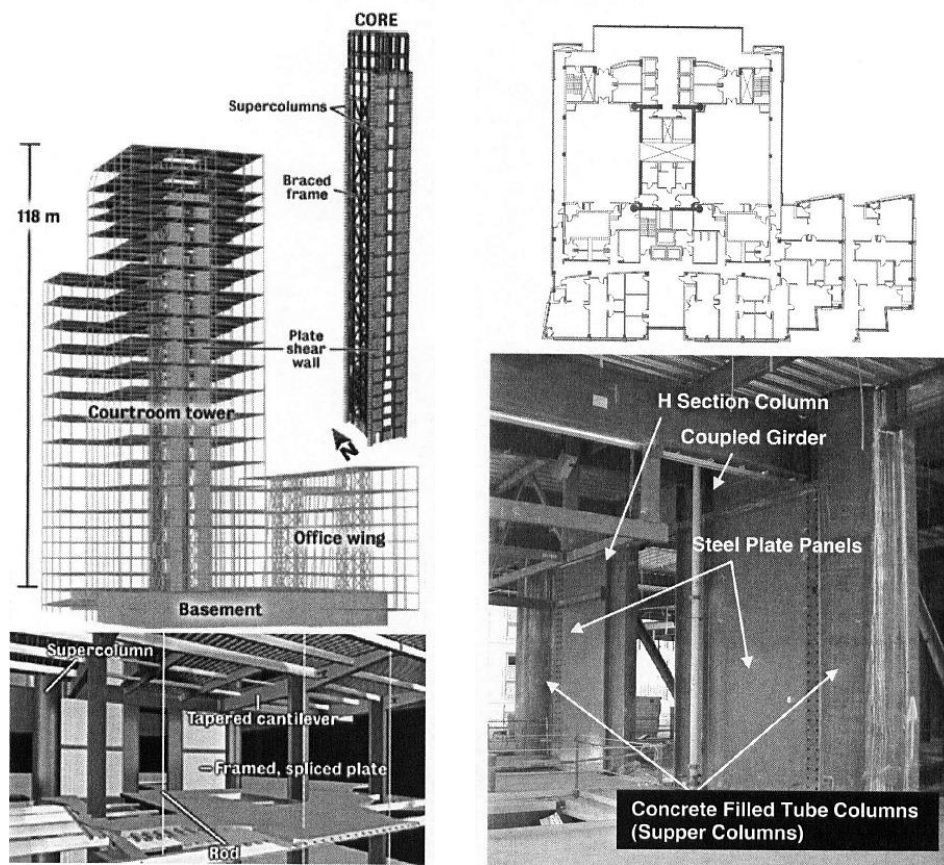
24-story U.S. Courthouse Building, Seattle, WA. (photo courtesy of Magnusson Klemencic Associates)
